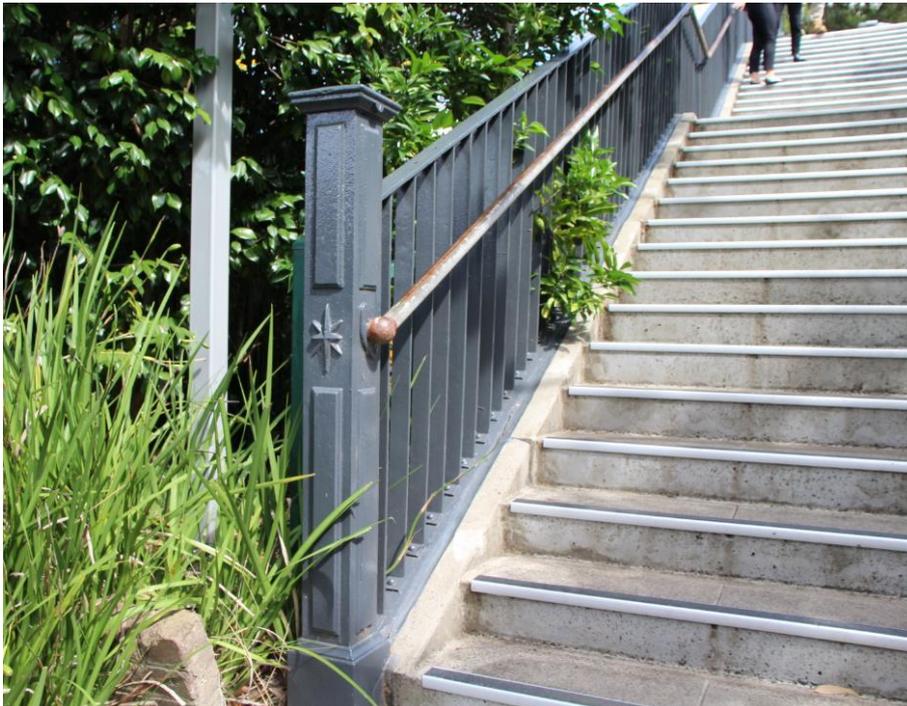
Original star patterned newel posts, balustrades and handrails at the Werona Avenue (eastern) access to footbridge. These are also present on the Culworth Avenue side of the footbridge (AECOM, 2021)
